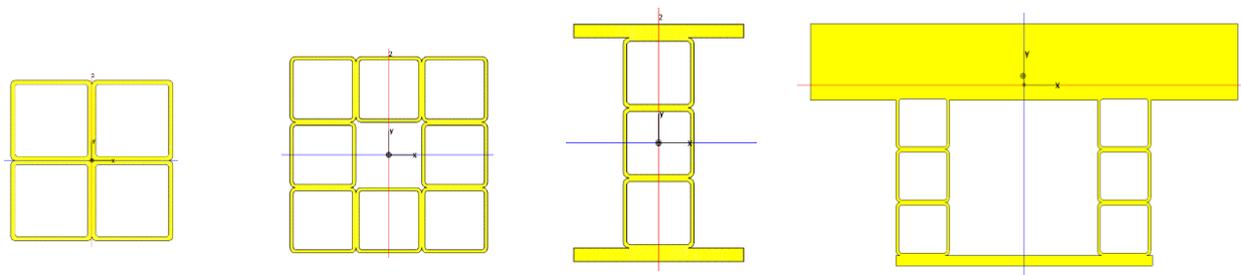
Typical CFT section profiles (bonded square section, bonded box section, bonded I-beam, bonded U-Girder)
